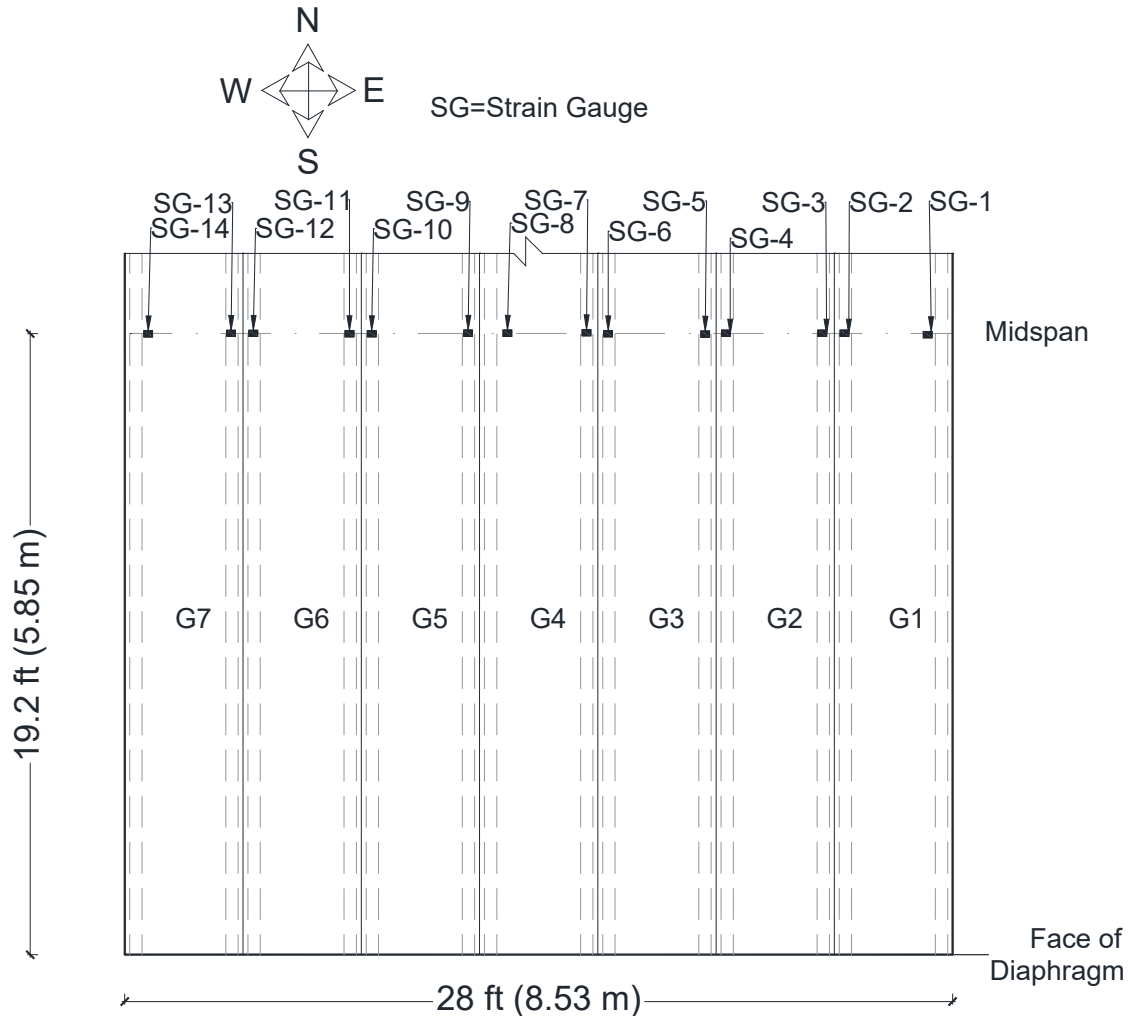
Strain Gauge Instrumentation Plan for Flexural Response of 30-in. (762-mm) Deep Double-Tee Girder Bridge – Plan View
